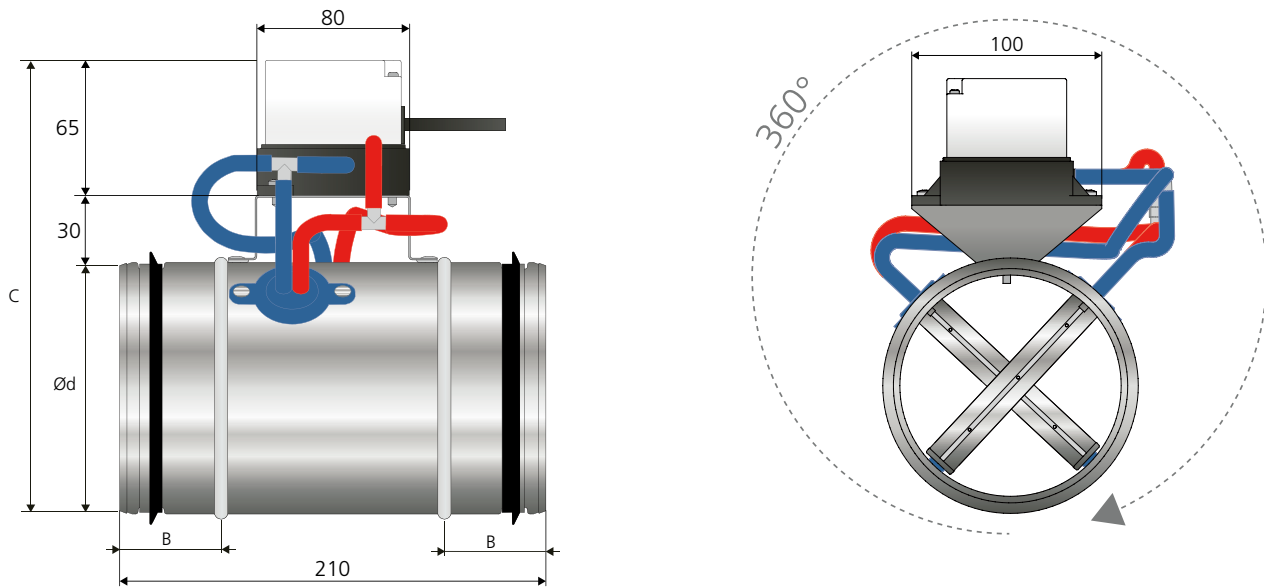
Dimensions (mm), REACT M GMB circular. The measurement unit can be installed at an optional angle.
